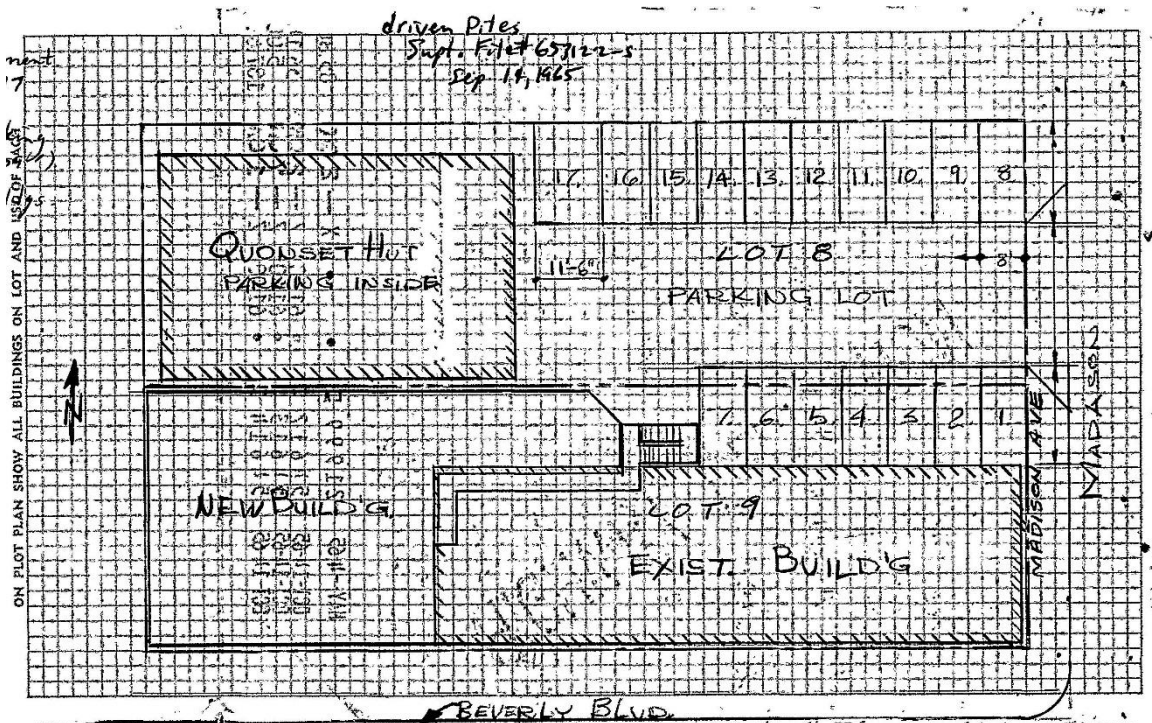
1965 Permit showing new addition to existing building and Quonset hut (Permit 1965LA06160)
